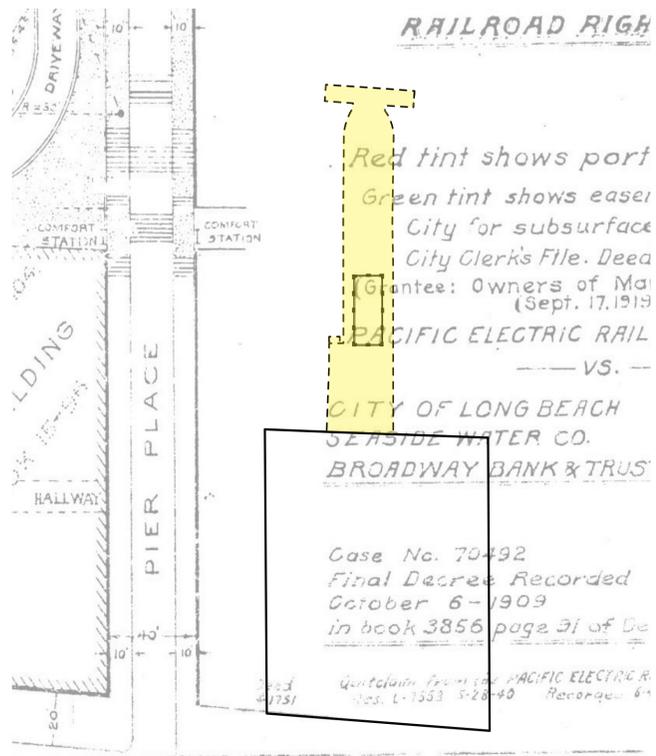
1936 site plan. Source: City of Long Beach, courtesy of GBD Architects.
